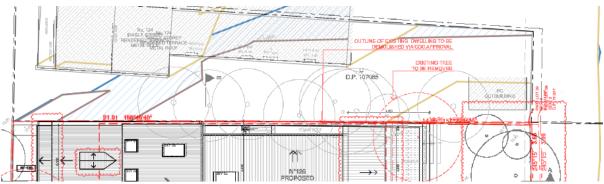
Overlay of site submitted site plan and shadow diagram for 3pm during winter solstice
